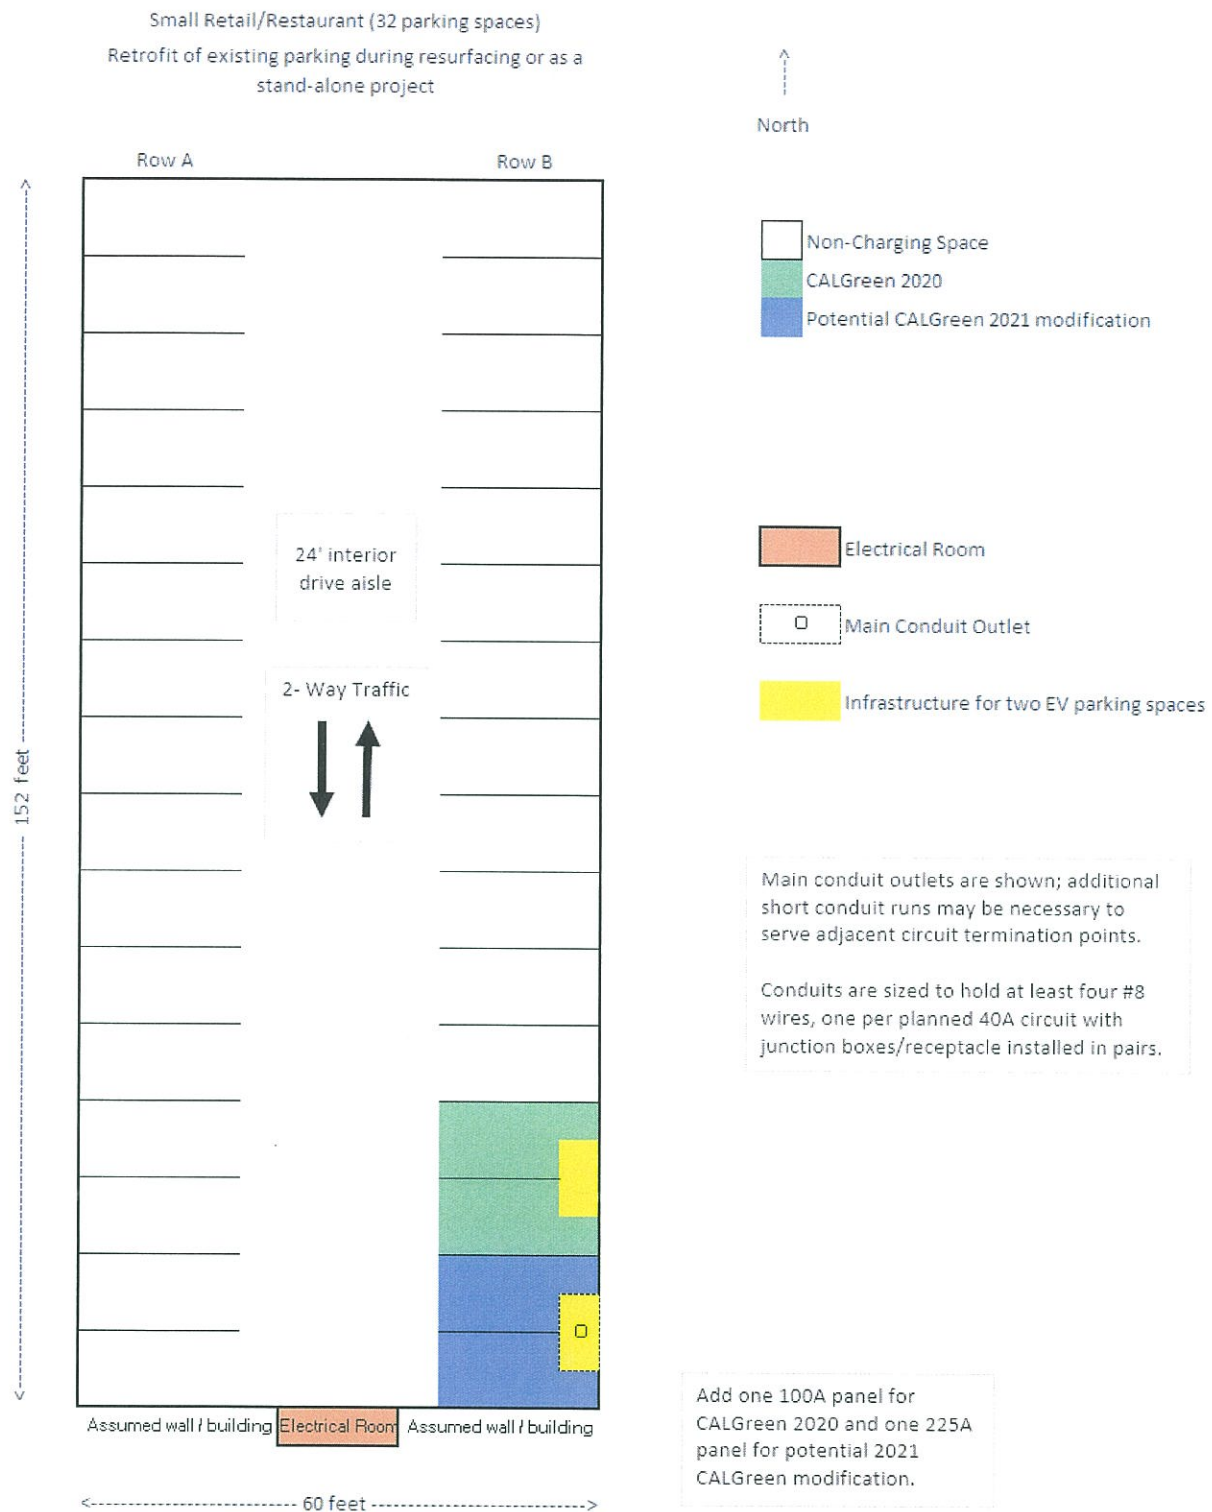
Retrofit scenario of small retail/restaurant parking area with 32 parking spaces
